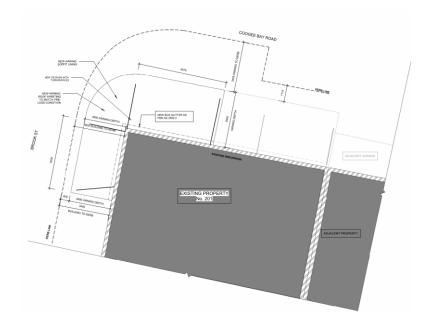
The proposed replacement awning at the corner of Brook Street and Coogee Bay Road
